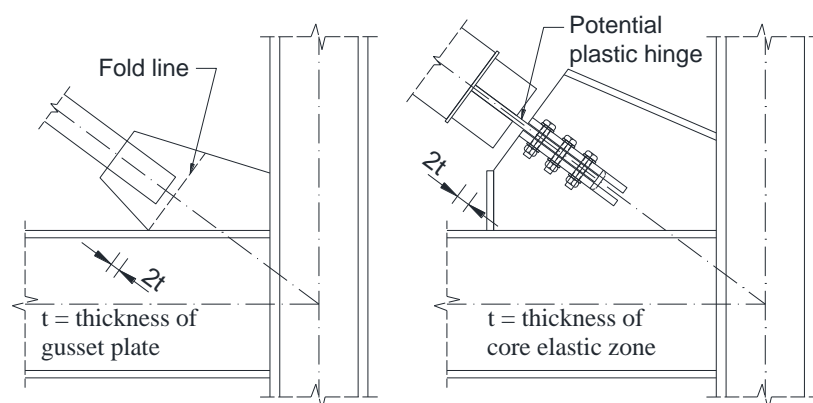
Brace-to-gusset connection details: a) AISC requirement [100], b) proposal [6]
